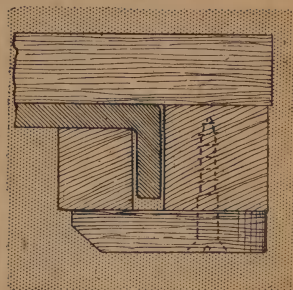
Fixing Clamped Board to Iron Mantelshelf
